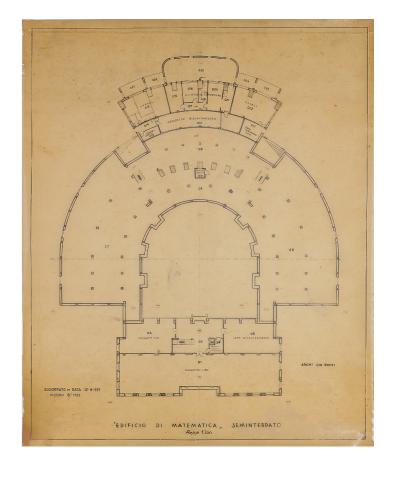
Plan of the basement designed by Ponti in June 1935; details are provided regarding the house of the porter and his family, located at the foot of the classroom tower with its systems and garages (ASS drw 69)
